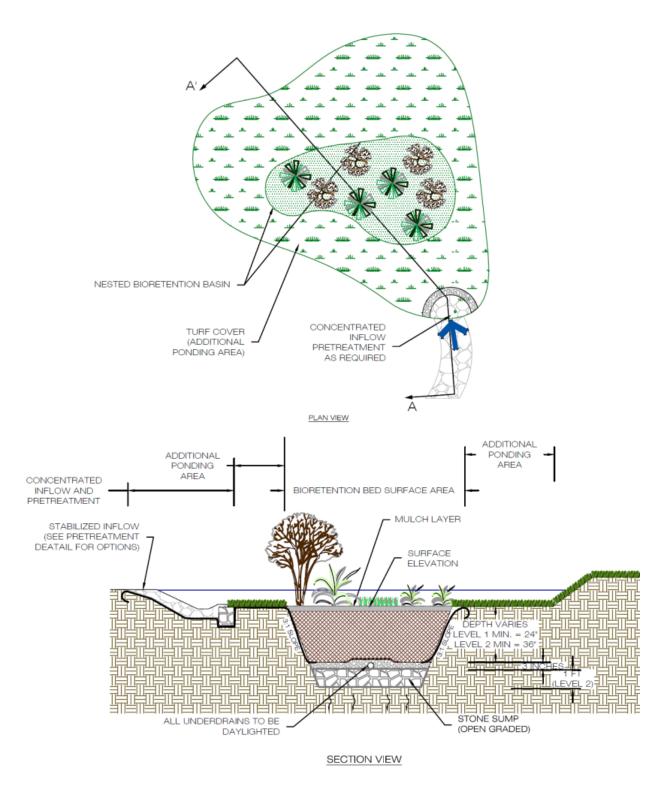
Typical Detail of Bioretention with Additional Surface Ponding
